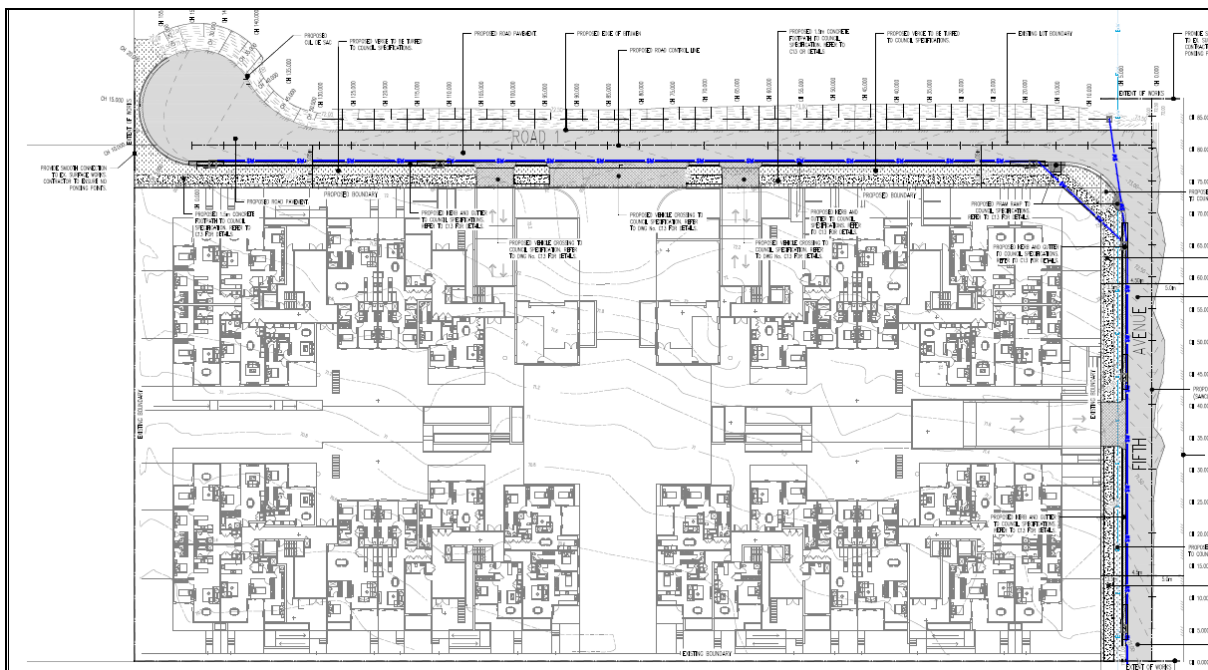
Extract of the Civil Works Plan showing temporary turning head on an adjoining site without obtaining any adjoining owner's consent.
